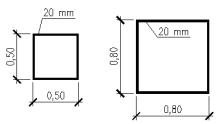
Analyzed cross sections of bars in: inner cross braces (a) and top and bottom flange support cross braces (b)
